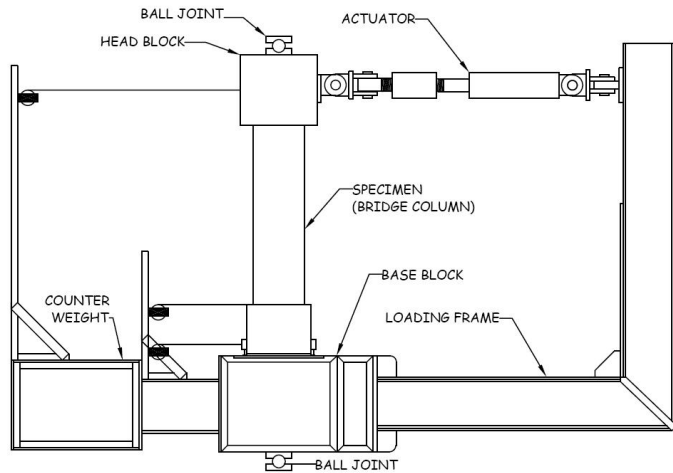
East-west elevation of the testing apparatus. The layout is identical in the north-south direction.
